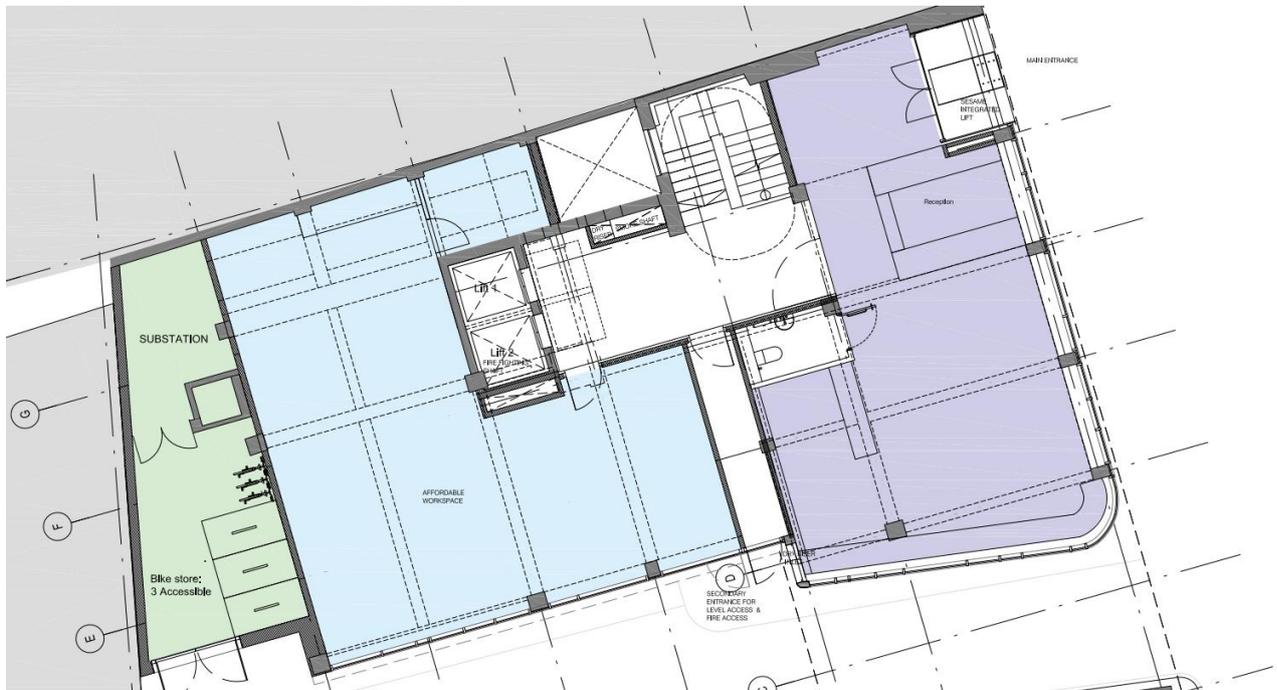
Proposed ground floor floorspace showing affordable workspace area (blue)
